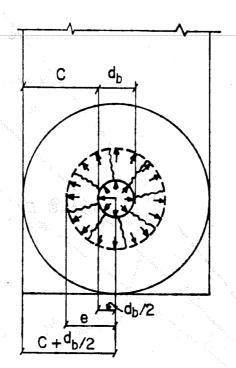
Internal cracks surrounding a deformed bar in concrete.
